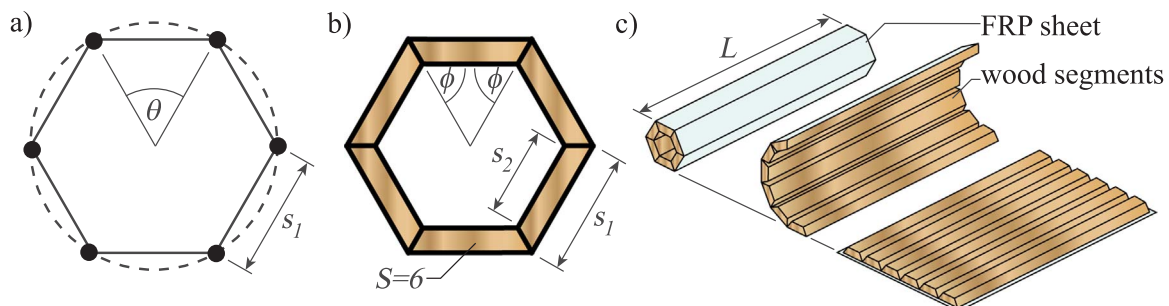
Folded hybrid FRP-timber section concept. a) Specification of polygonal geometry. b) Generation of trapezoidal wood segments. c) Unrolled section with FRP hinging connections.
